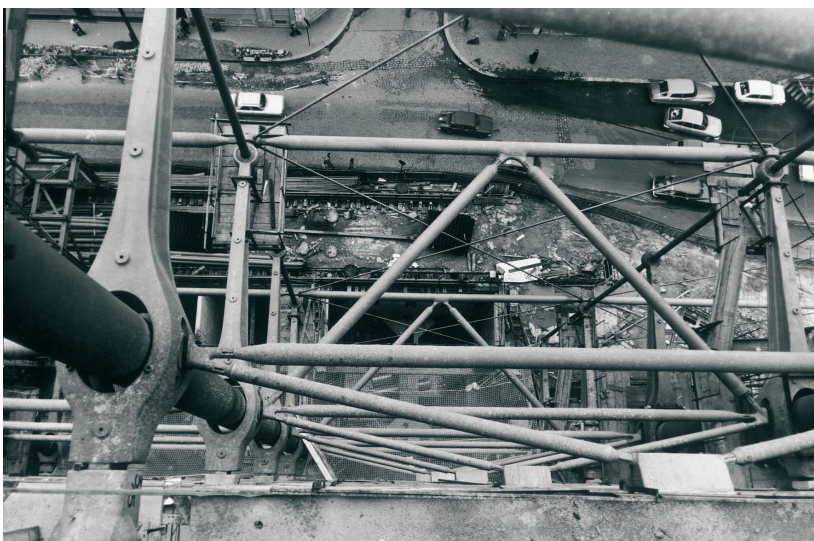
Photo from the Centre Pompidou construction showing a view of the bracing from the upper levels of the eastern façade. Photo by courtesy of Fondazione Renzo Piano, for details see the figure credits list.
